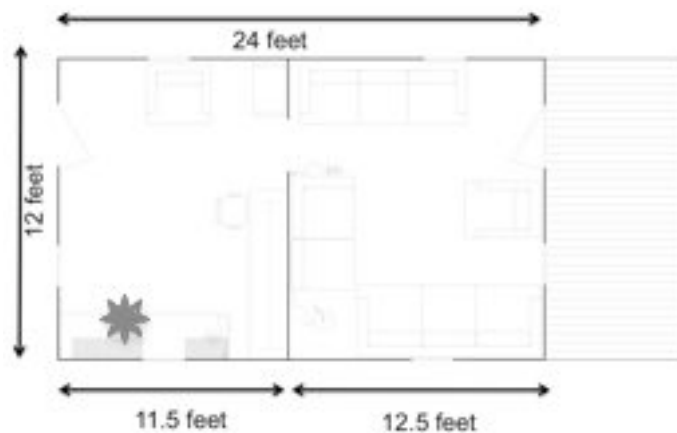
Layout of Chico burn building. The open porch is to the right. The left (rear) door was closed. The front was open. The center doorway is open.
